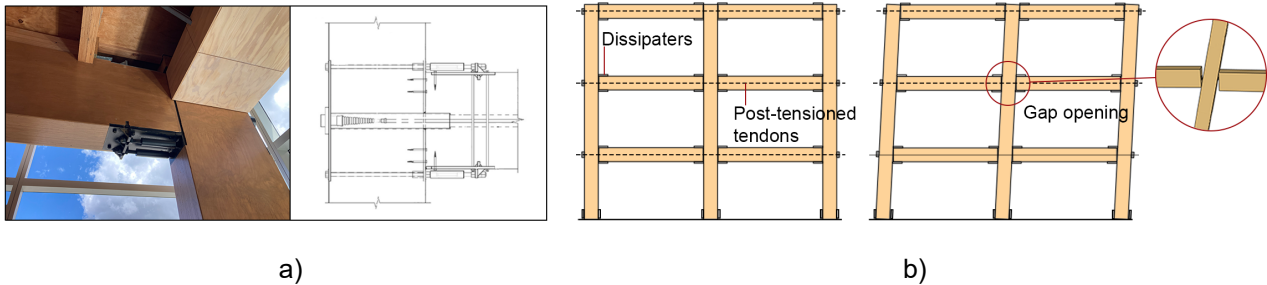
a) Pres-Lam beam-to-column connection detail with Plug&Pay dissipaters on top and bottom of the beam, Merritt building (modified after Miliziano et al., 2020); a) Pres-Lam frame and its peculiar rocking mechanism.
